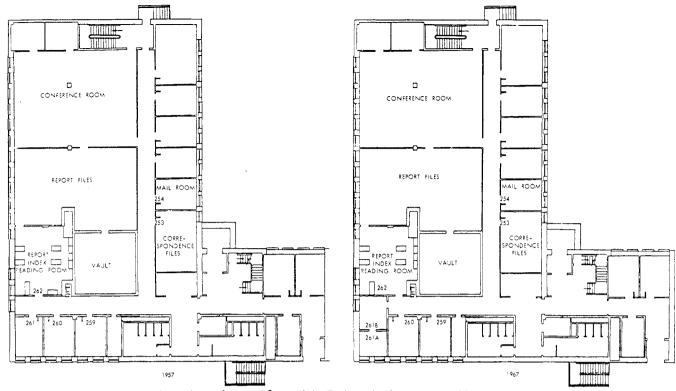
Floor plans of second floor of the Technical Information Building in 1957 and 1967
